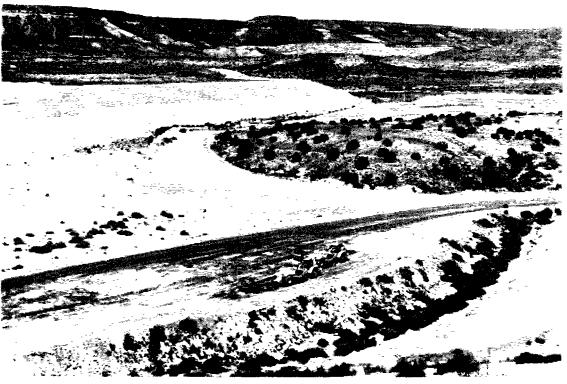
Scrapers picking up contaminated soil from JP-CS-37 (looking northwest);
